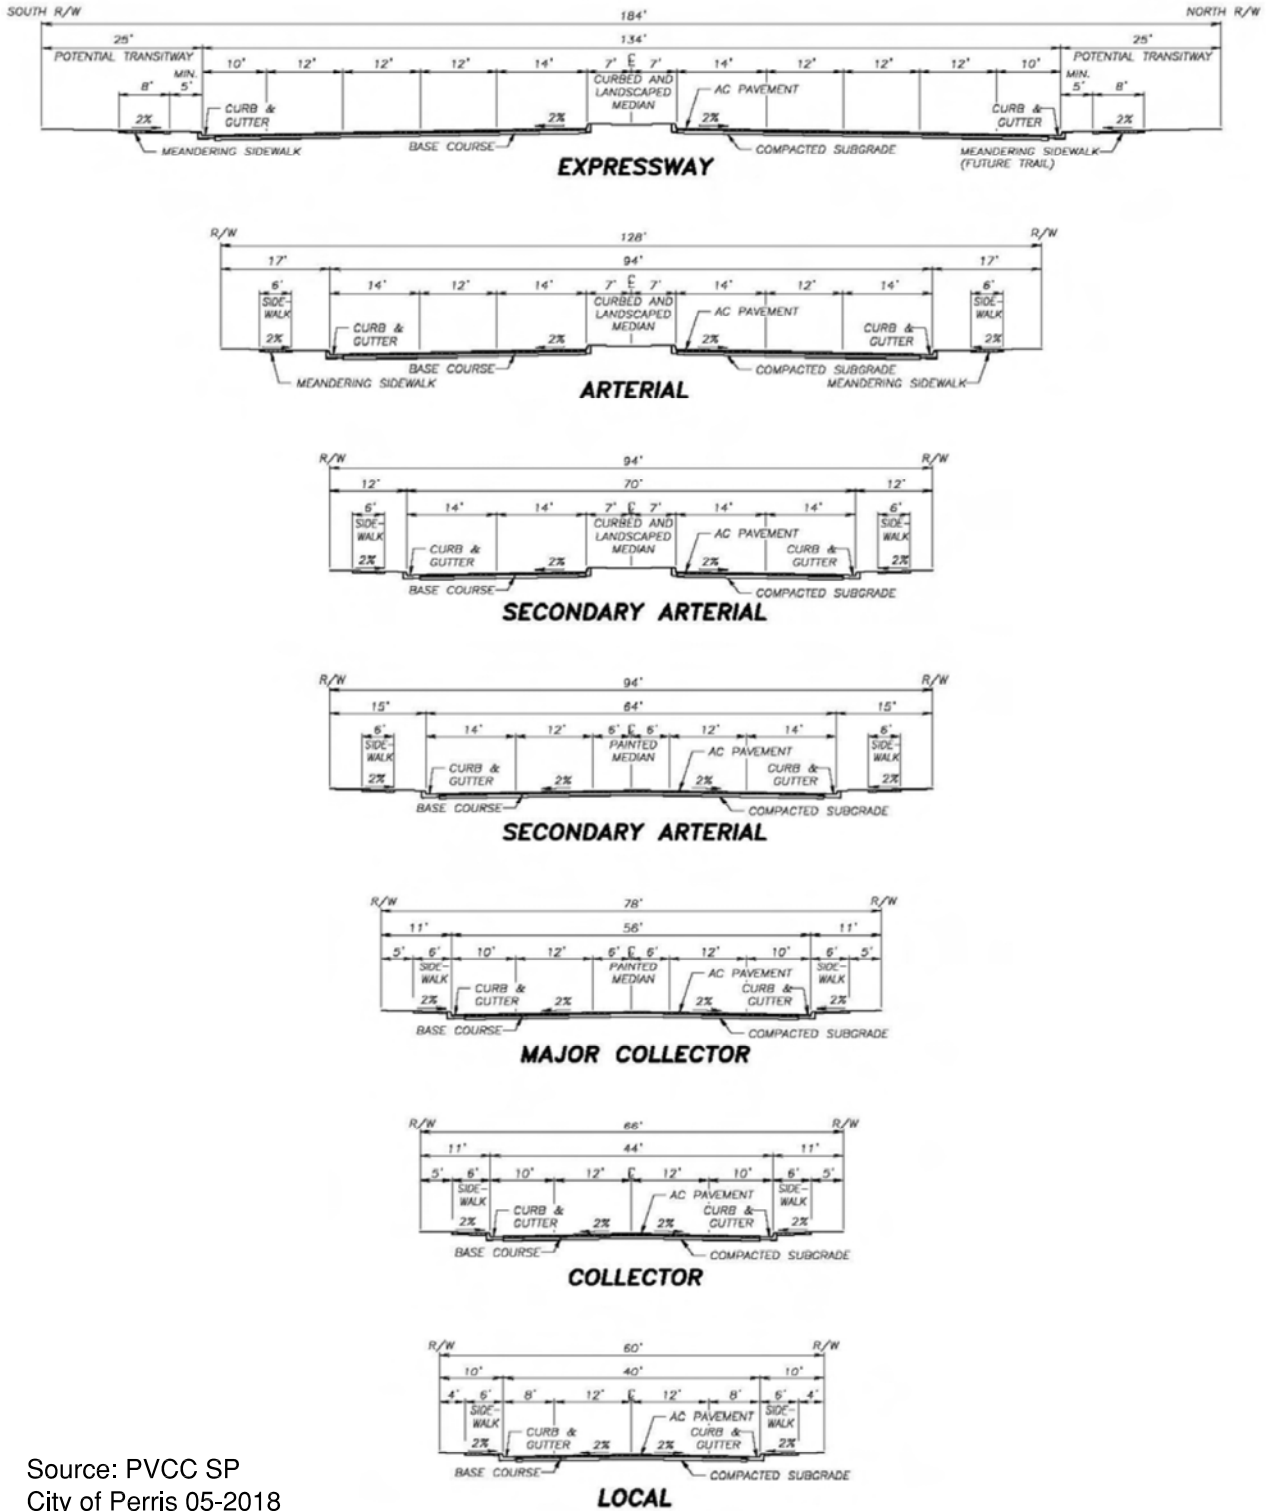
PERRIS VALLEY COMMERCE CENTER SPECIFIC PLAN CIRCULATION PLAN
